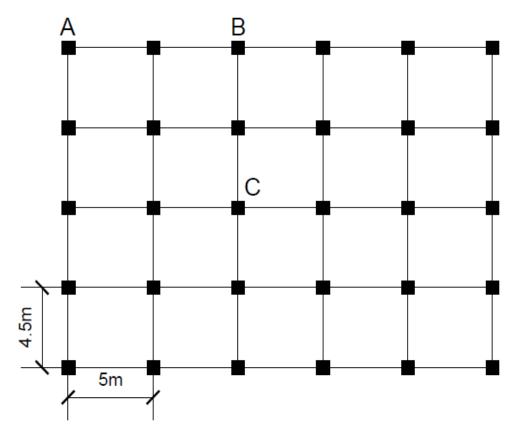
Location of selected columns A, B & C in plan of the building
